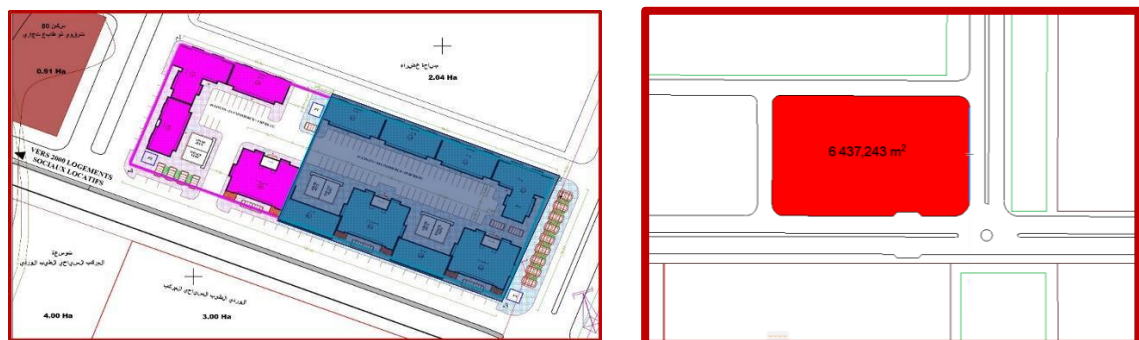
Site plot. (Source: design office Nebar Omar +Author treatment , 2025).
